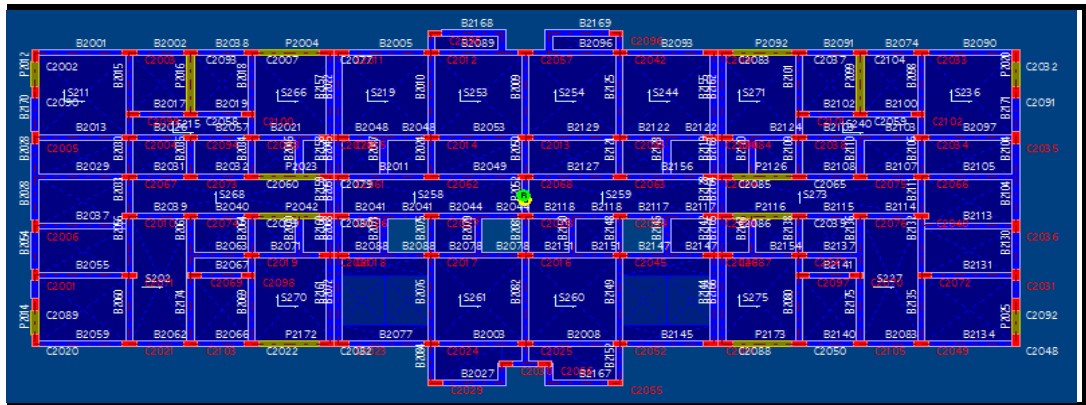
Plan of Twenty Stories and Coupled Shear Wall System
